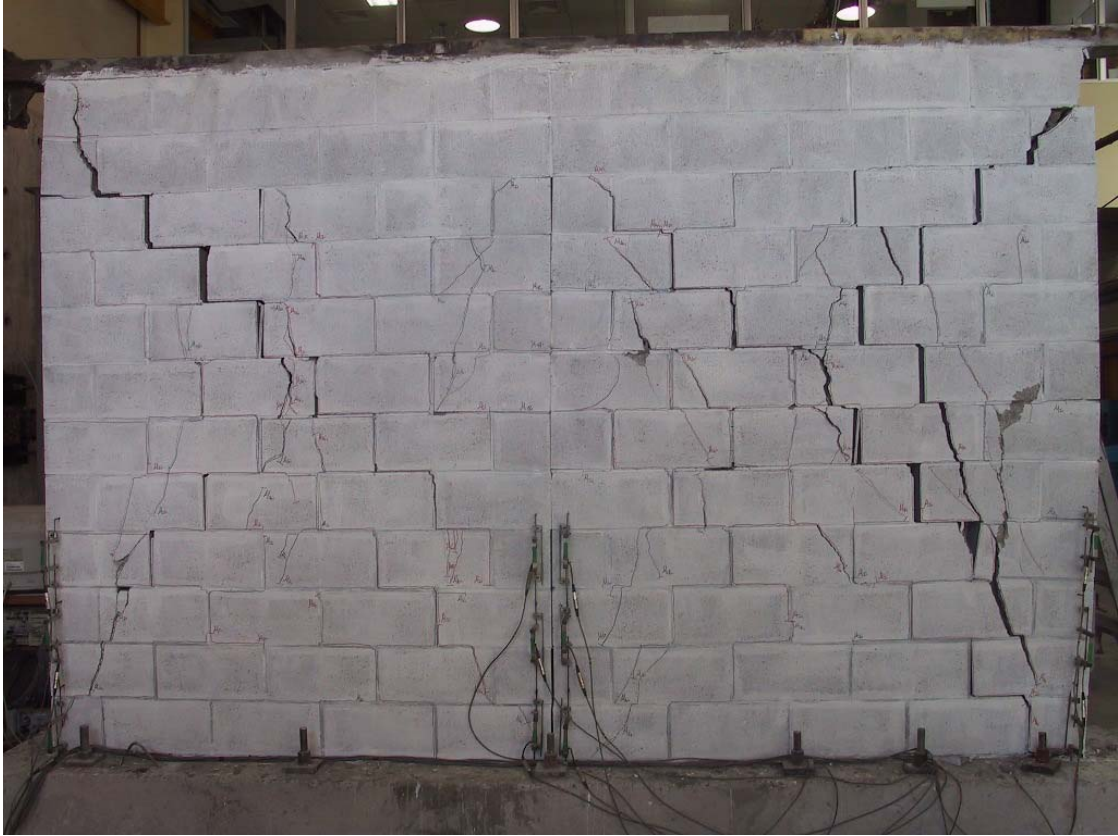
Series B, condition of Wall B9 at end of testing.
